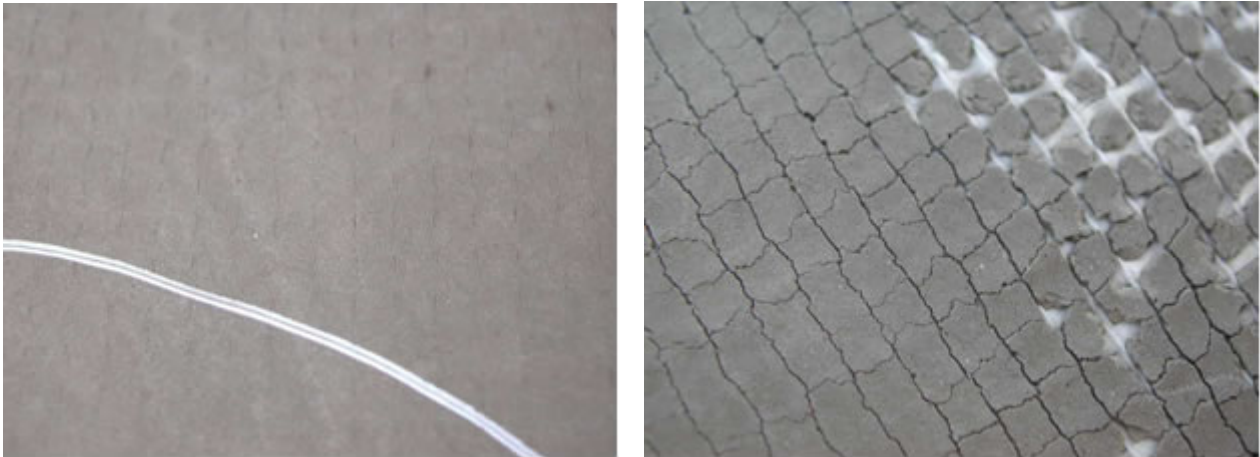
Crack on whitened wrinkle in fPP at floor/wall corner
